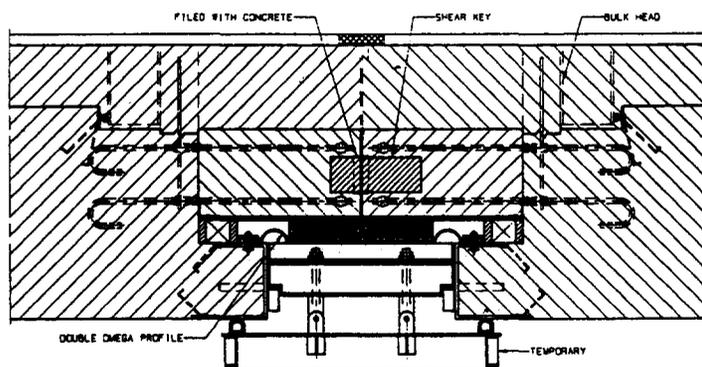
Closure joint formerly used in Dutch tunnels.
